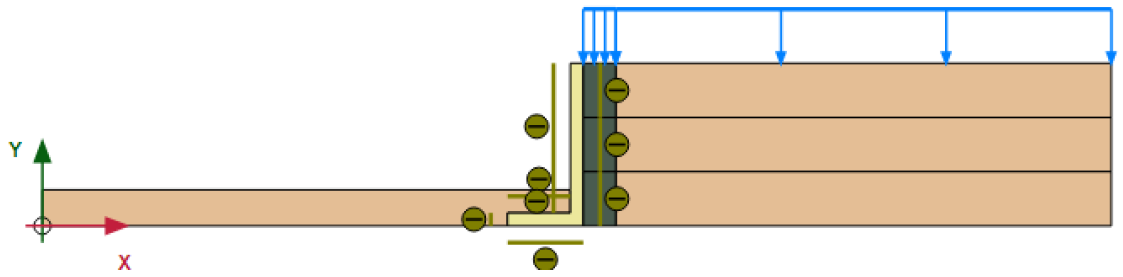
Retaining wall with no backfill slope and 0.9m width TDA backfill
